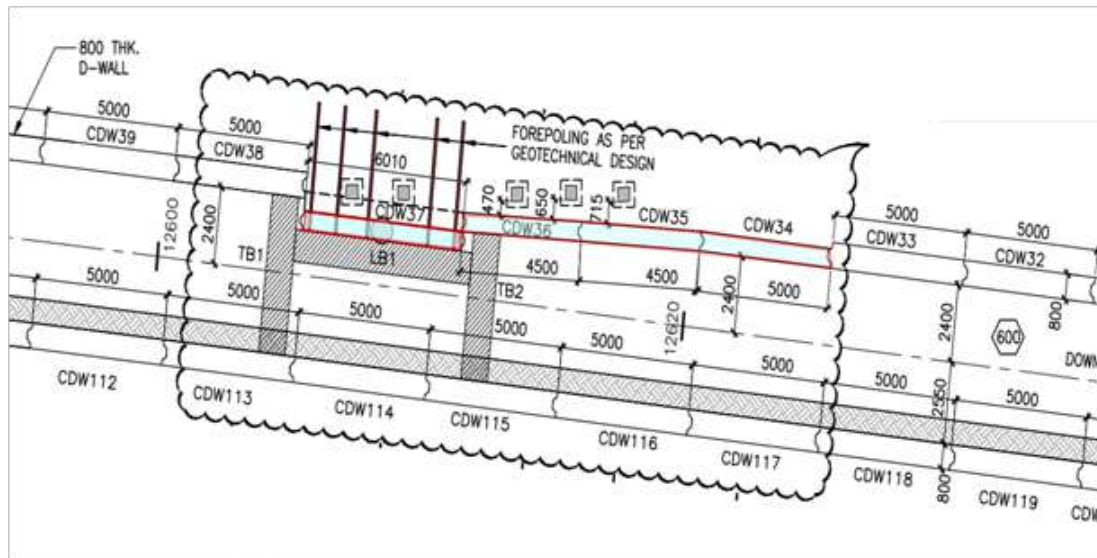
Plan showing the rearrangement of four D-Wall panels due to infringement of Portico column-footing.
